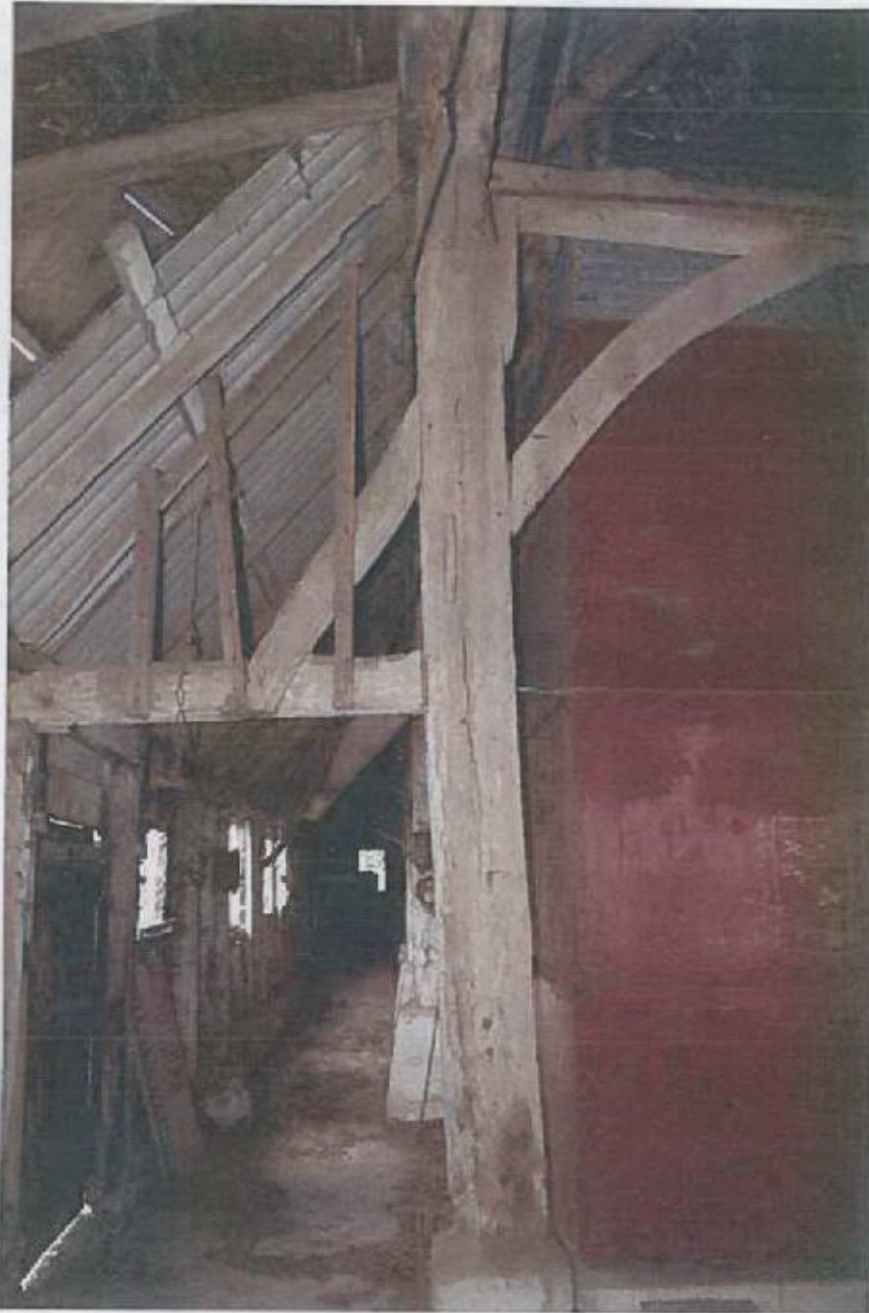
Note lack of jowl. Narrow braces and abandoned mortices.
